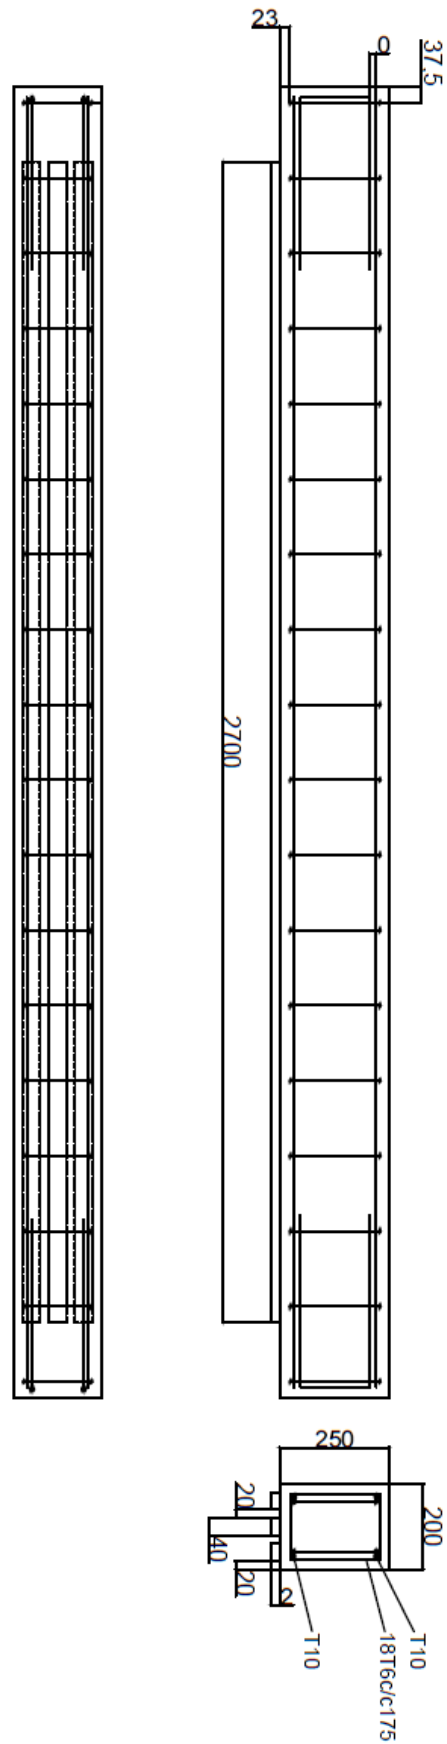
Steel plates application, fully reinforced beam, general drawings.
